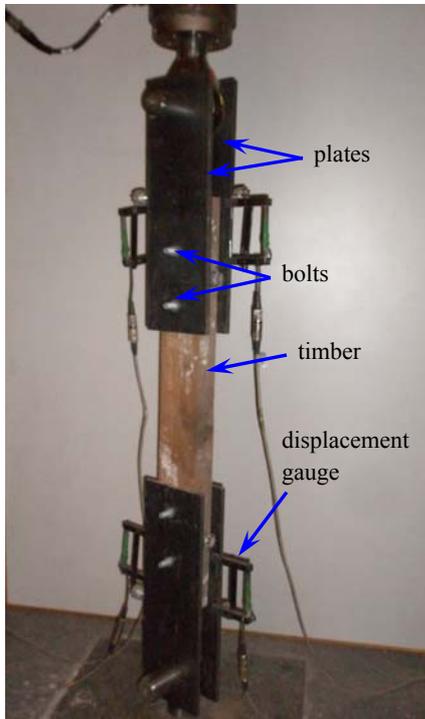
Typical specimen of bolted timber connection loaded parallel to the grain in testing apparatus
